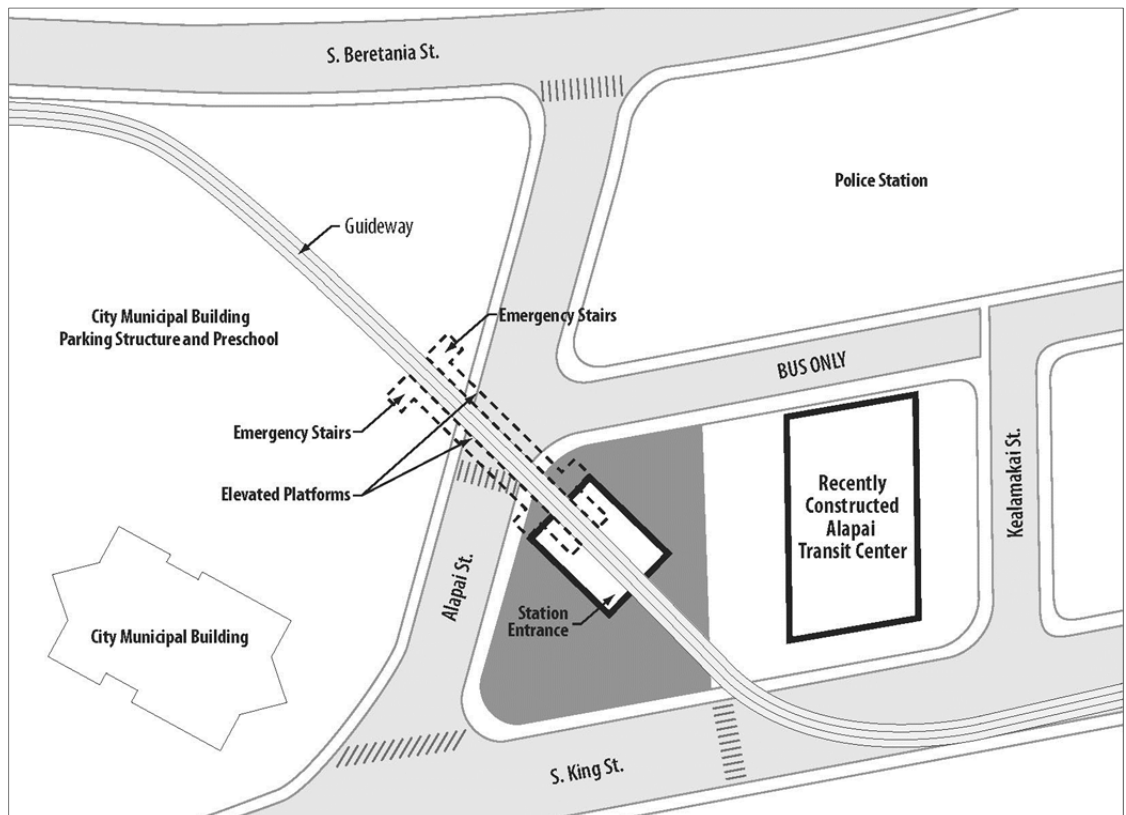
Beretania Street Tunnel Alternative Alapai Street Station
